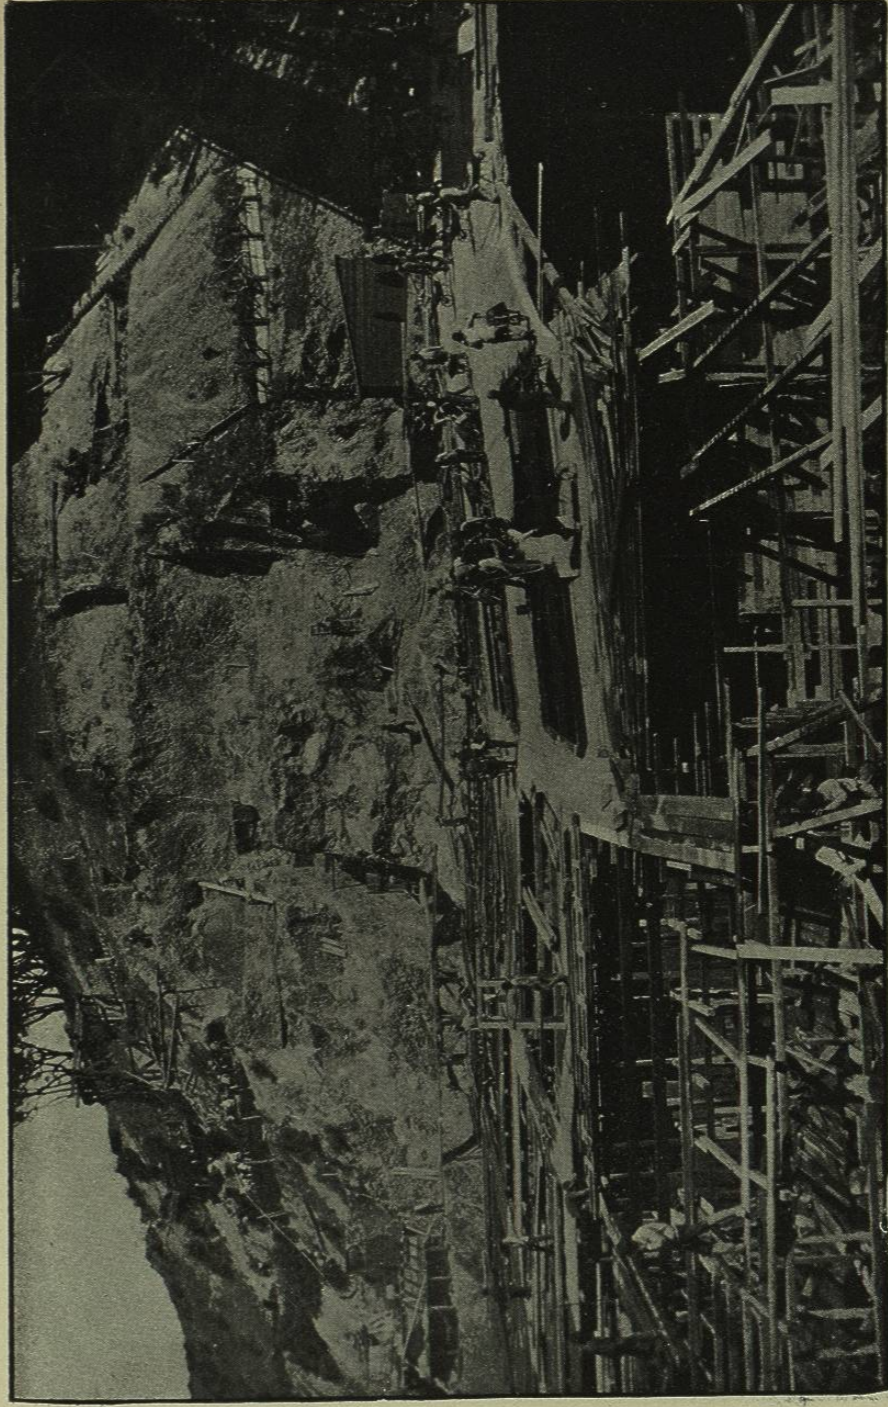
MOULDS FOR CONCRETE BLOCKS, SAN MATEO DAM.
